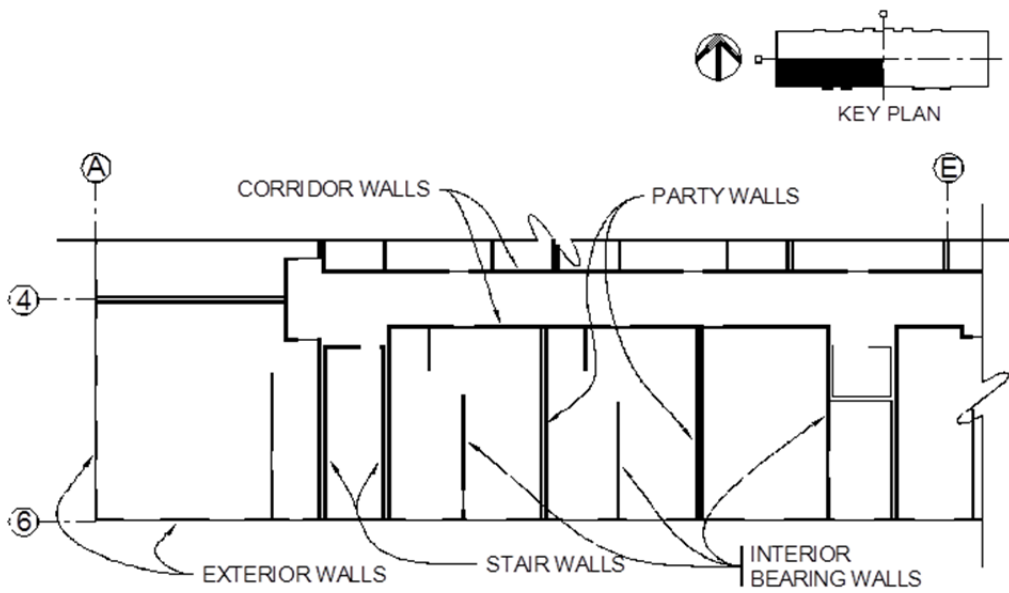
Plan of shear walls (southwest corner) for wind design.
